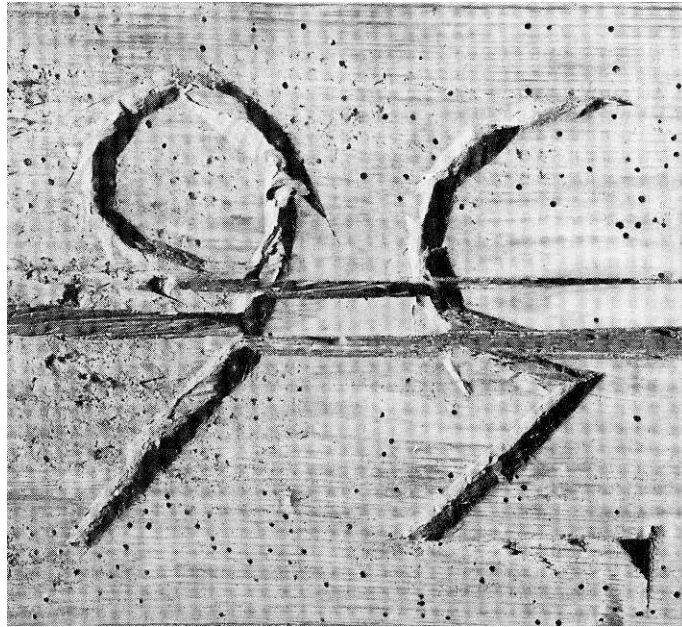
Carpenter's marks from Melville House, Fife (From Brunskill 1999, Fig 48)
